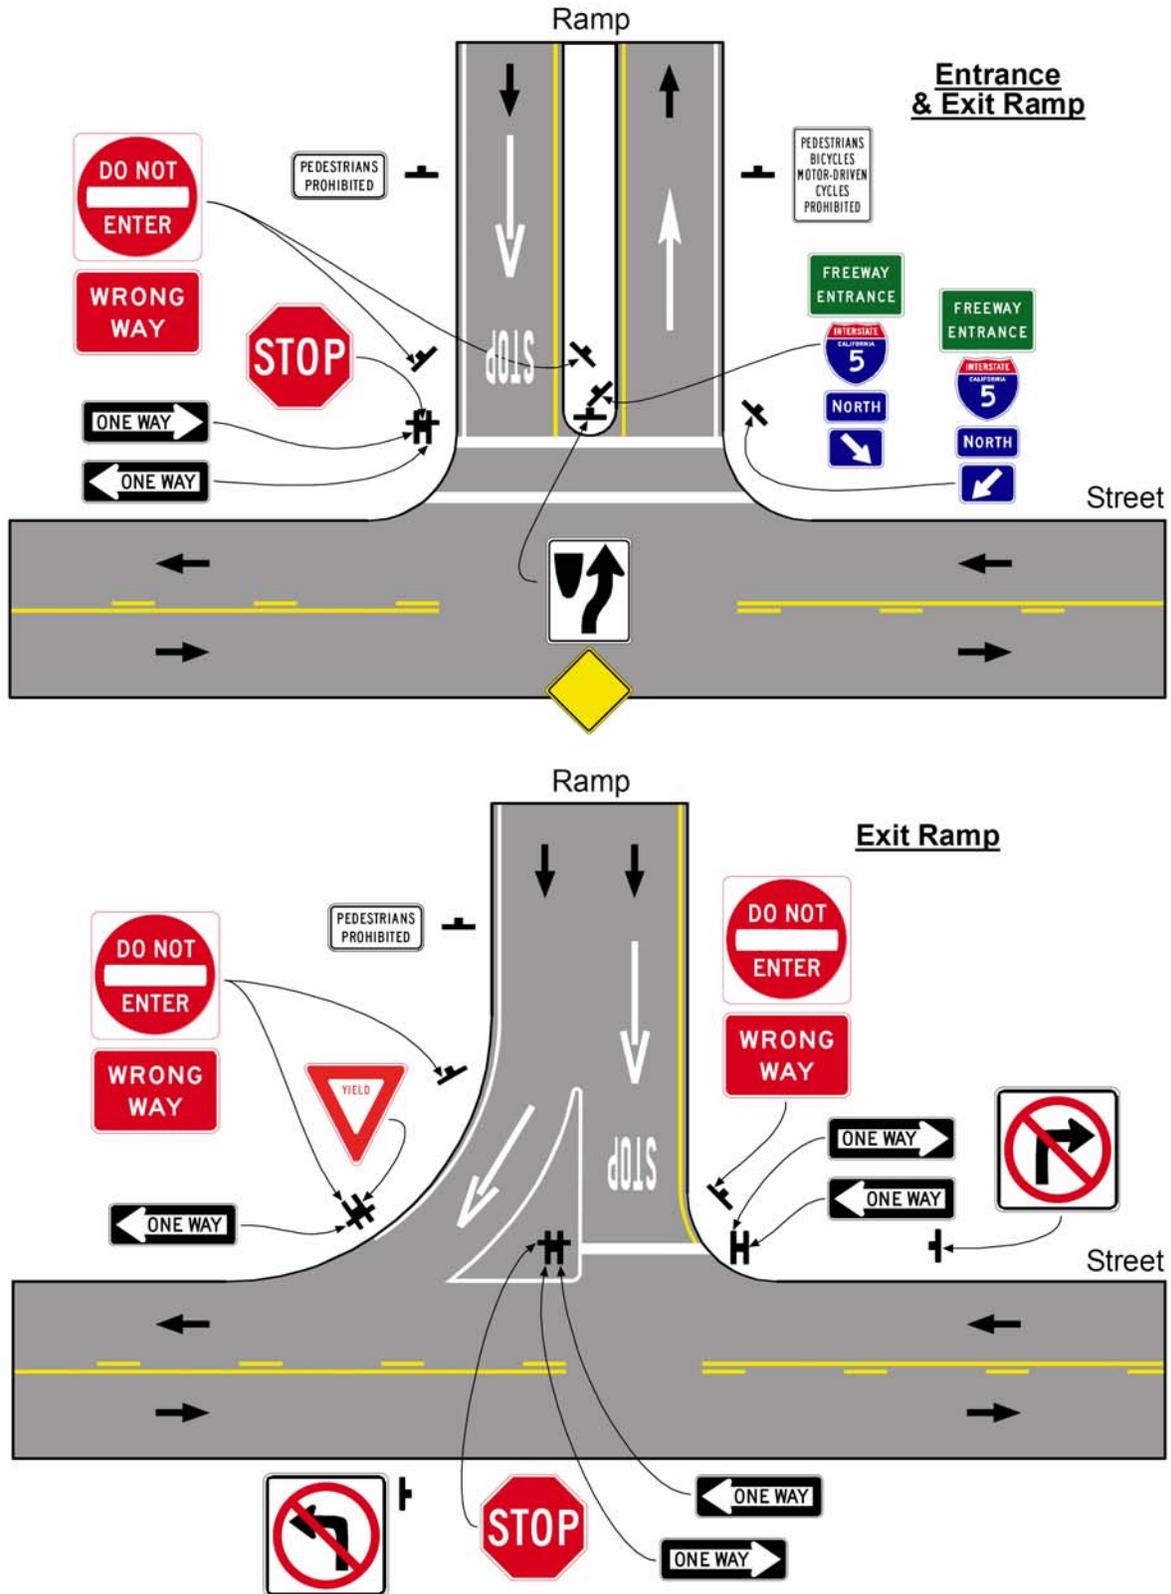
E-39 (CA). Examples of Regulatory Signing and Pavement Markings at Ramp Terminations to Deter Wrong-Way Entry (Sheet 5 of 5)
